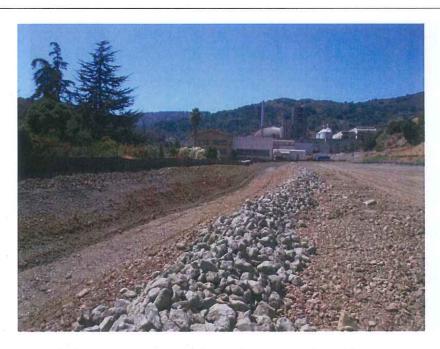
Looking south at drainage channel that flows northward to discharges EMSA stormwater into Pond 30. Dated September 3, 2015.
